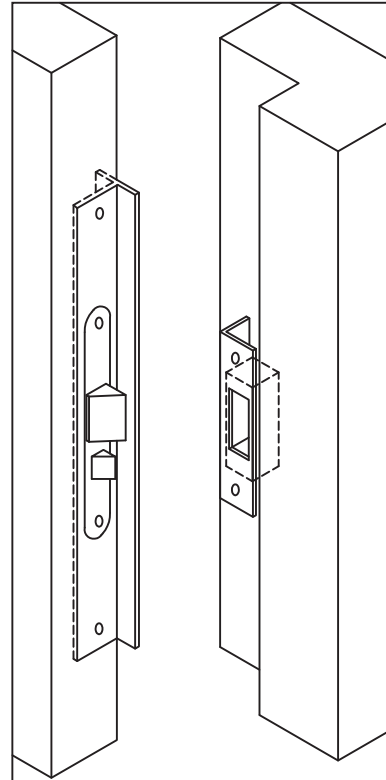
STEEL LOCK GUARD FOR NON-REBATED DOOR
